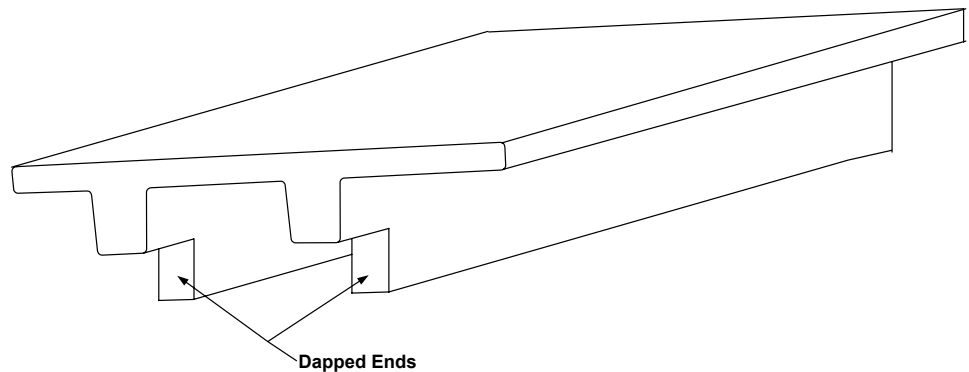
Dapped End of a Prestressed Double Tee Beam
